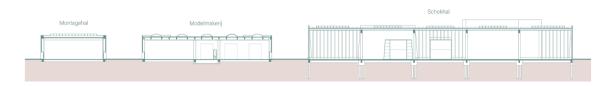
Section 01 Schokbeton (Made by author, 2024)
